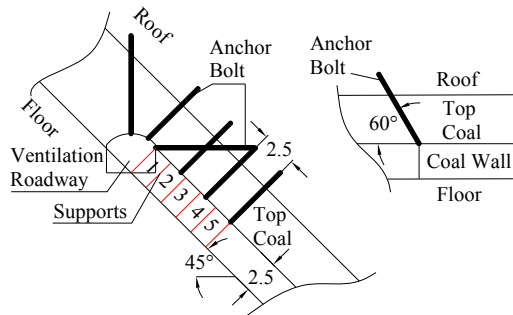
Schematic diagram of reinforcing top-coal in haulage roadway
